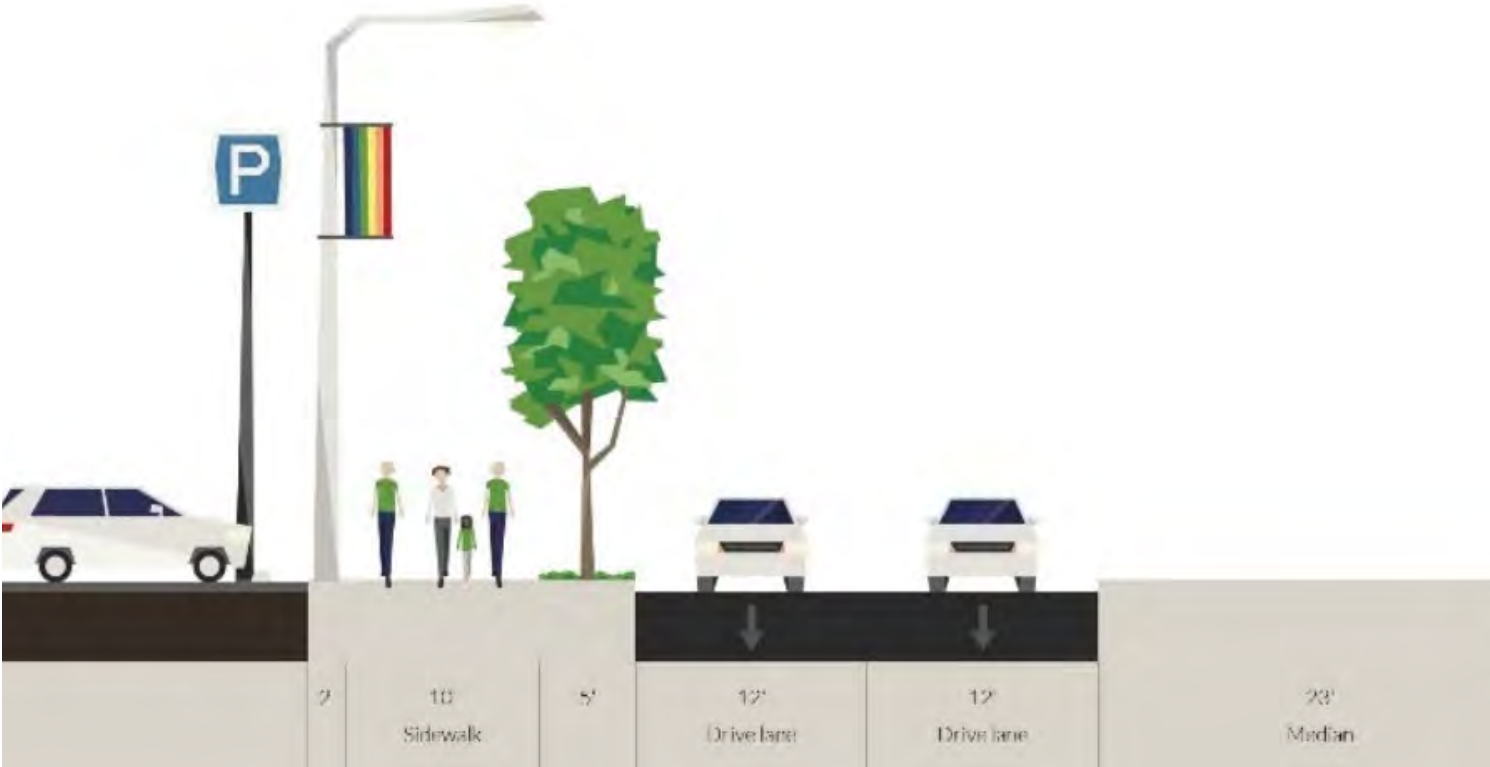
Cross Section: Branchview Dr. – Lake Concord Rd. to Bradley St. (Hospital Boundary)
